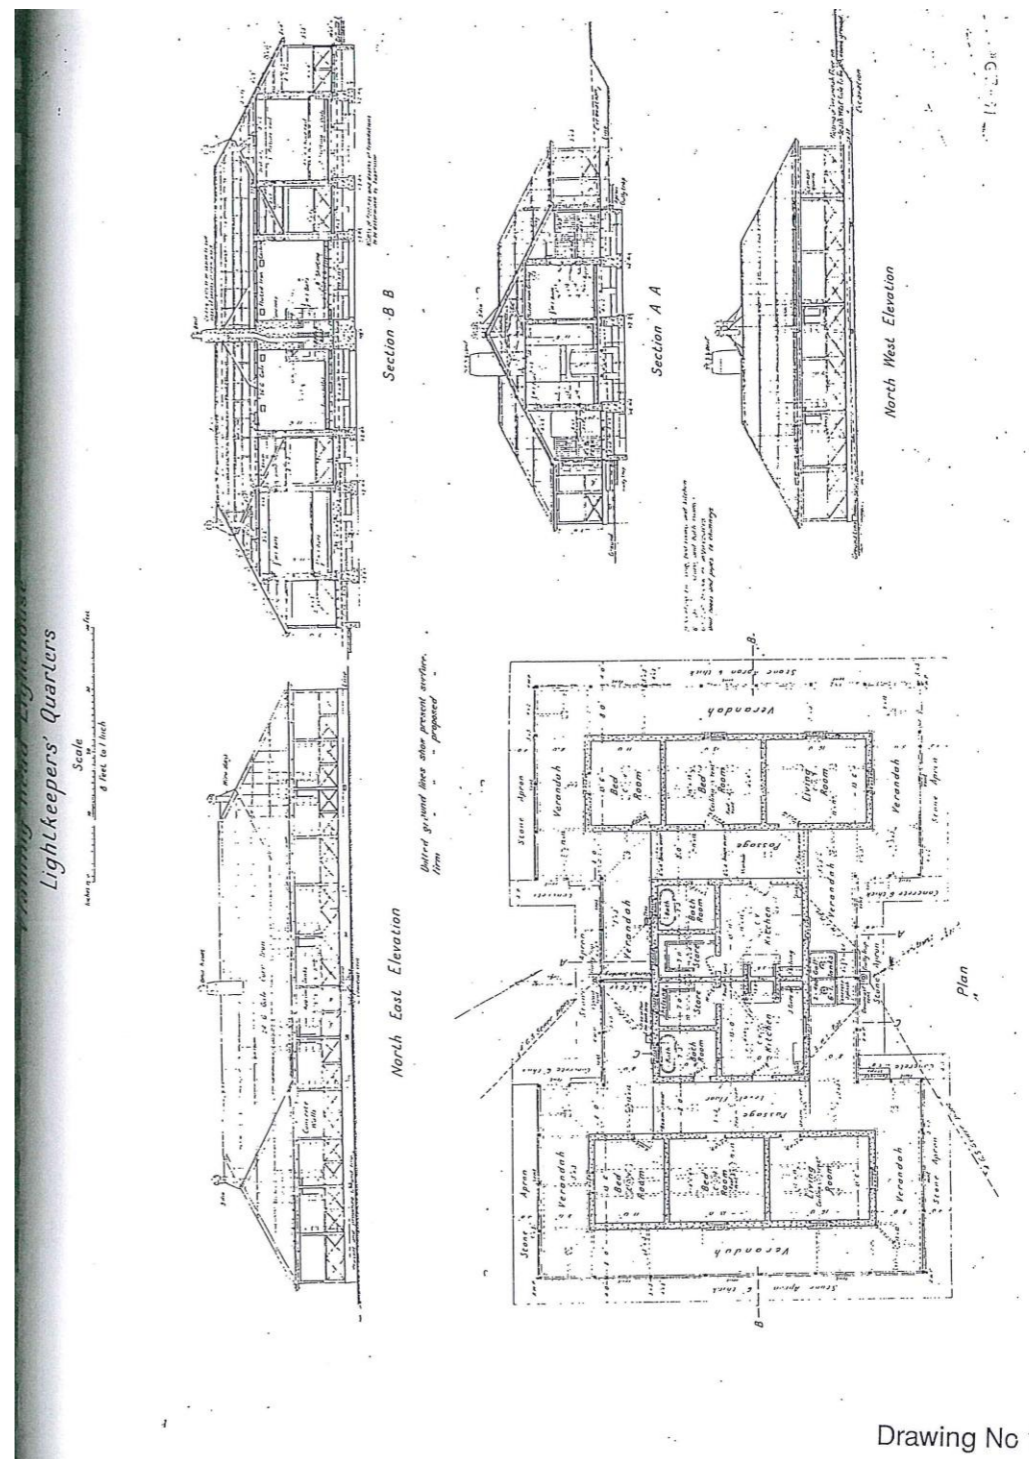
Lightkeepers Quarters Elevations & Floor Plan, Keen C, Conservation Plan
